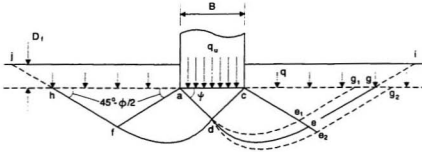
Bearing capacity failure in soil under a rigid strip footing
